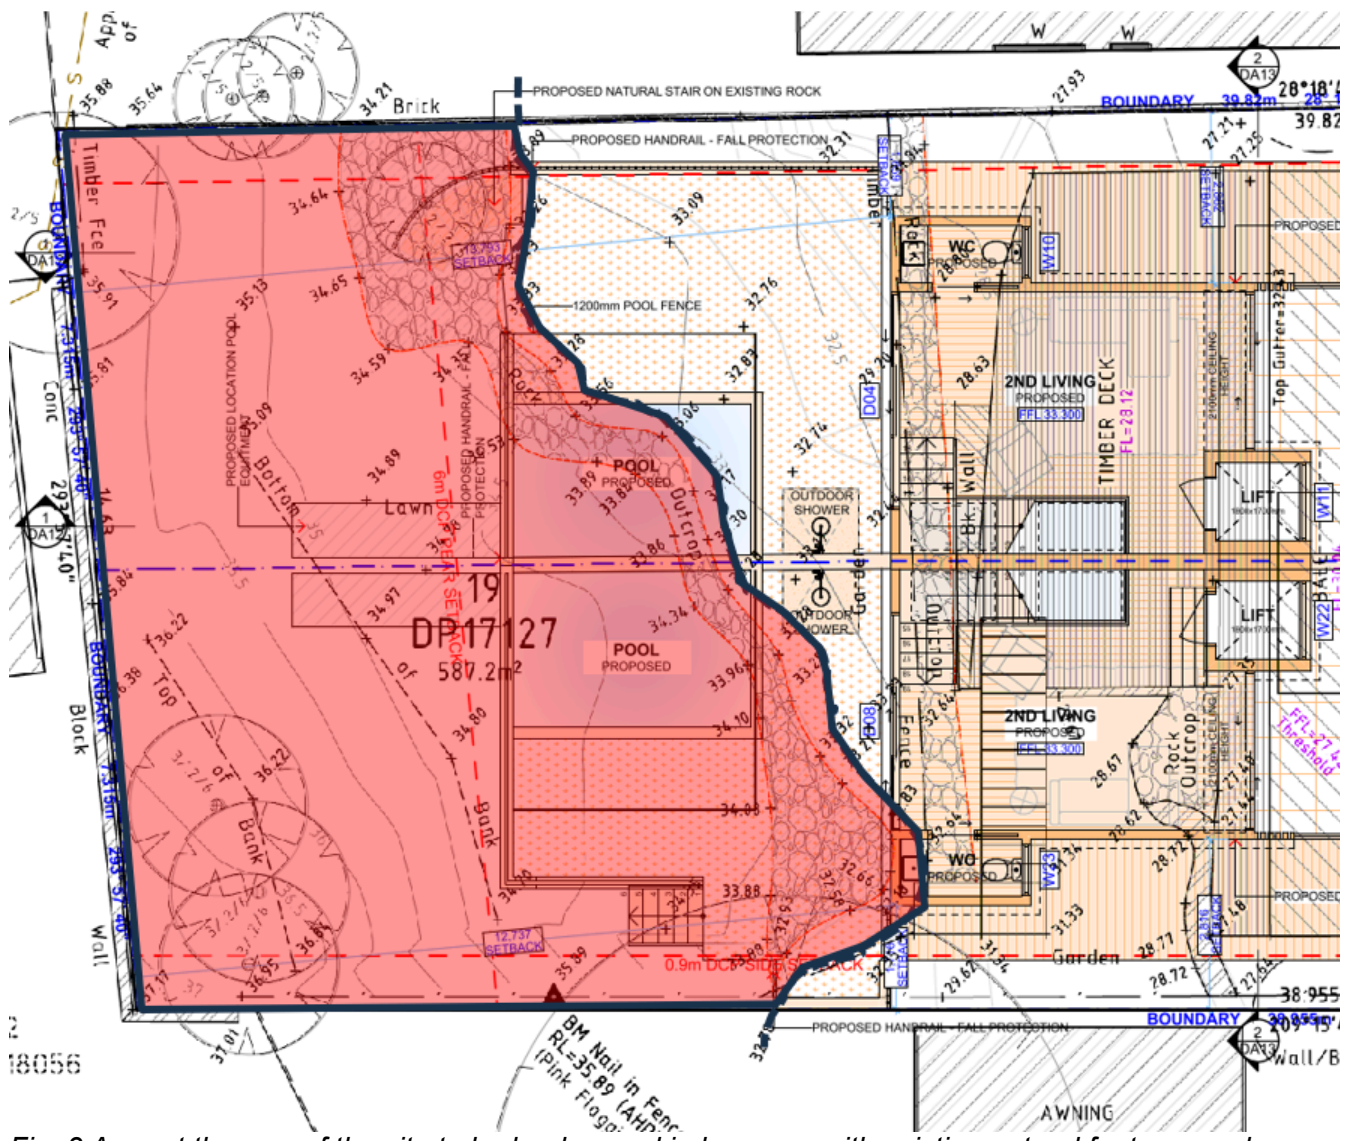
Area at the rear of the site to be landscaped in harmony with existing natural features and excavation avoided shown in red..
